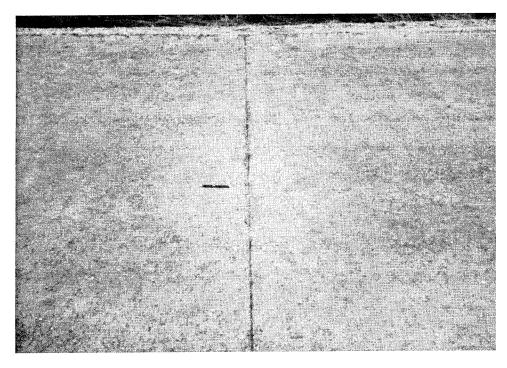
Transverse joint, sawcut, shown with a pencil to demonstrate scale
